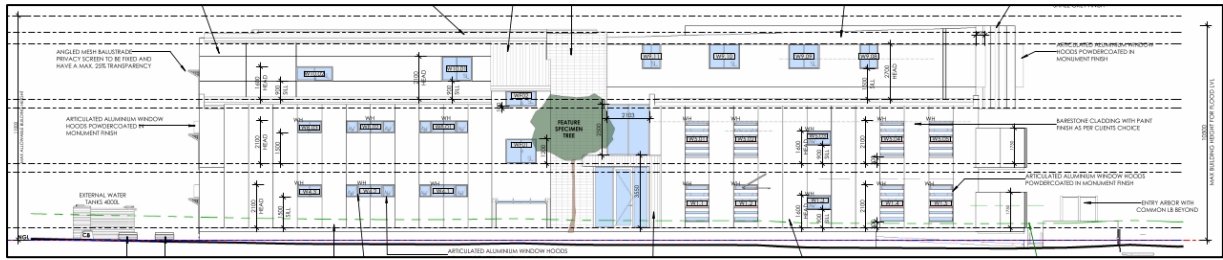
(Above): Southwest elevation showing presentation to land at 36 Barrabool Road. Source: Application documents.
